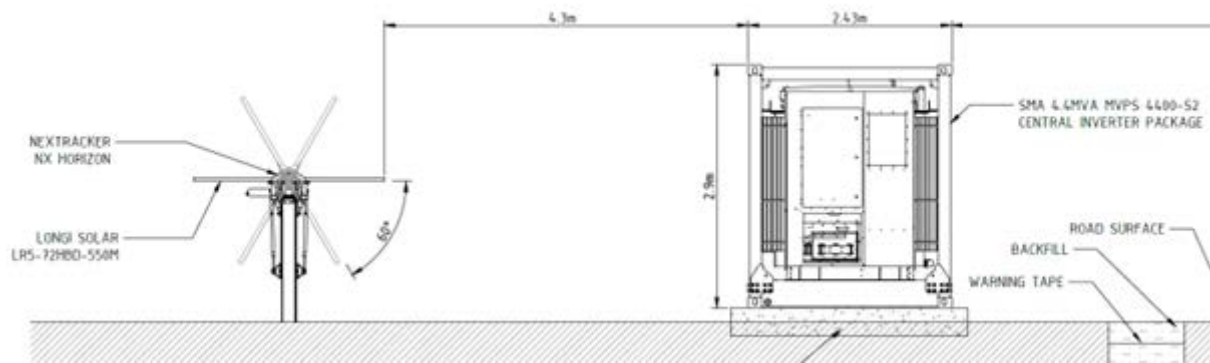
Inverter station typical cross section (Source: QGE Pty Ltd).
